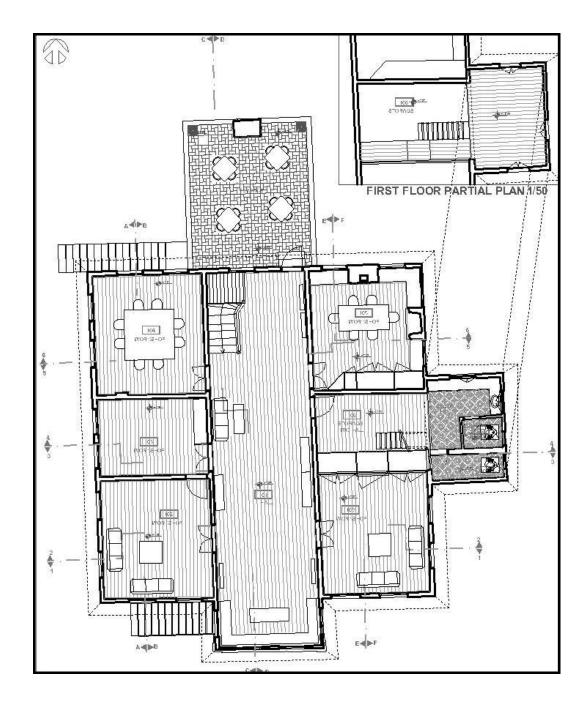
Conservation Proposal of Hasanağalar House – First Floor Plan
